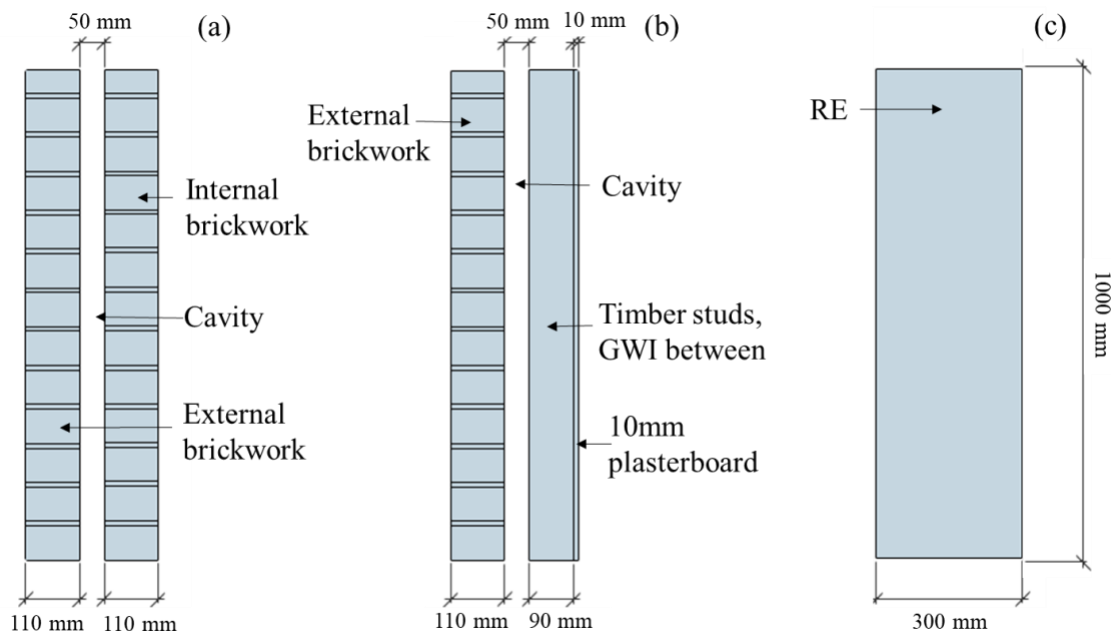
Cross-section of building envelope construction types; (a) cavity brick, (b) brick veneer, (c) rammed earth.
